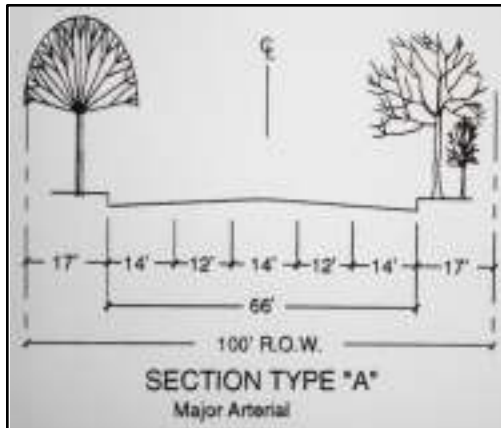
Typical major arterial as recommended in the 1995 Thoroughfare Plan
